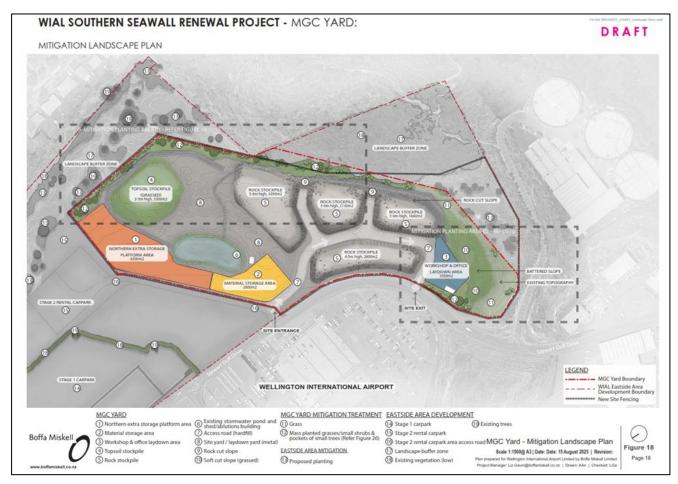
MGC Site and Mitigation Landscape Plan for the Miramar Golf Course, provided by Boffa Miskell, 15-08-2025
